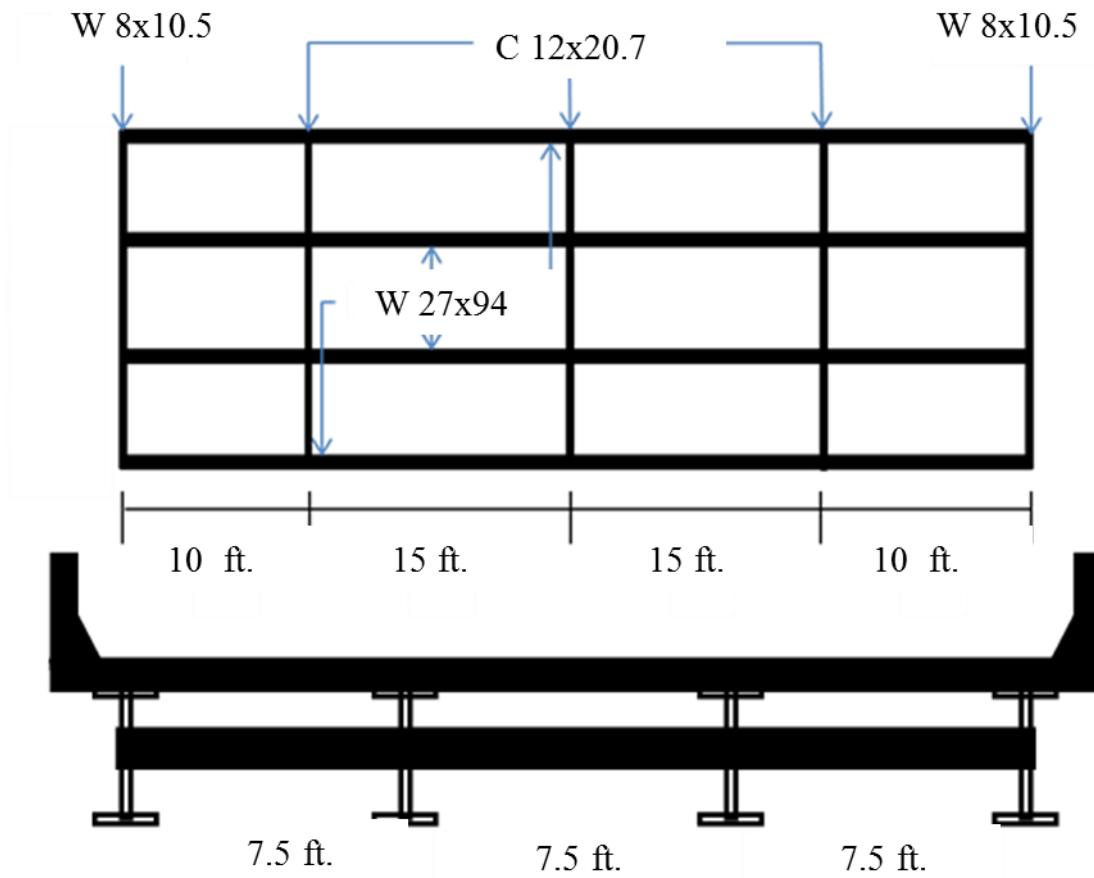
5 Plan and Cross-Section Views of Typical Bridge Span (Fernstrom et al.2012).
